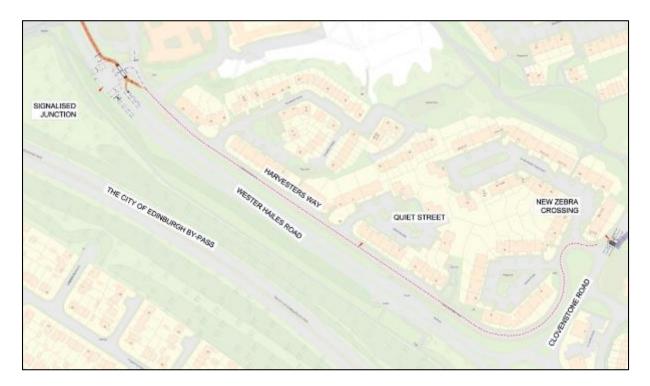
Quiet street alignment on Harvesters Way to Clovenstone Road
